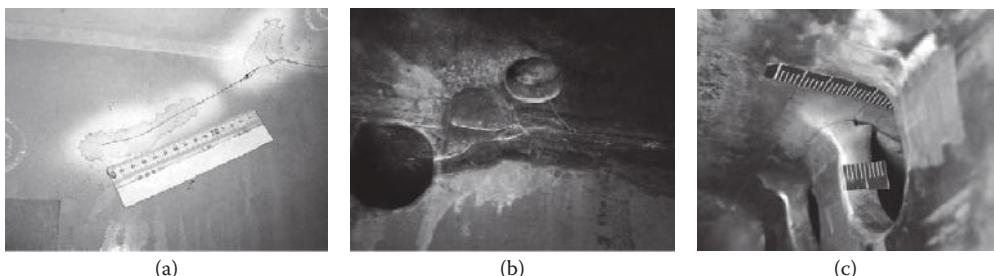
FR1-b-type cracks in weld bead: (a) Crack changes direction hole for FR1-b; (b) Branching crack; (c) Observation.
